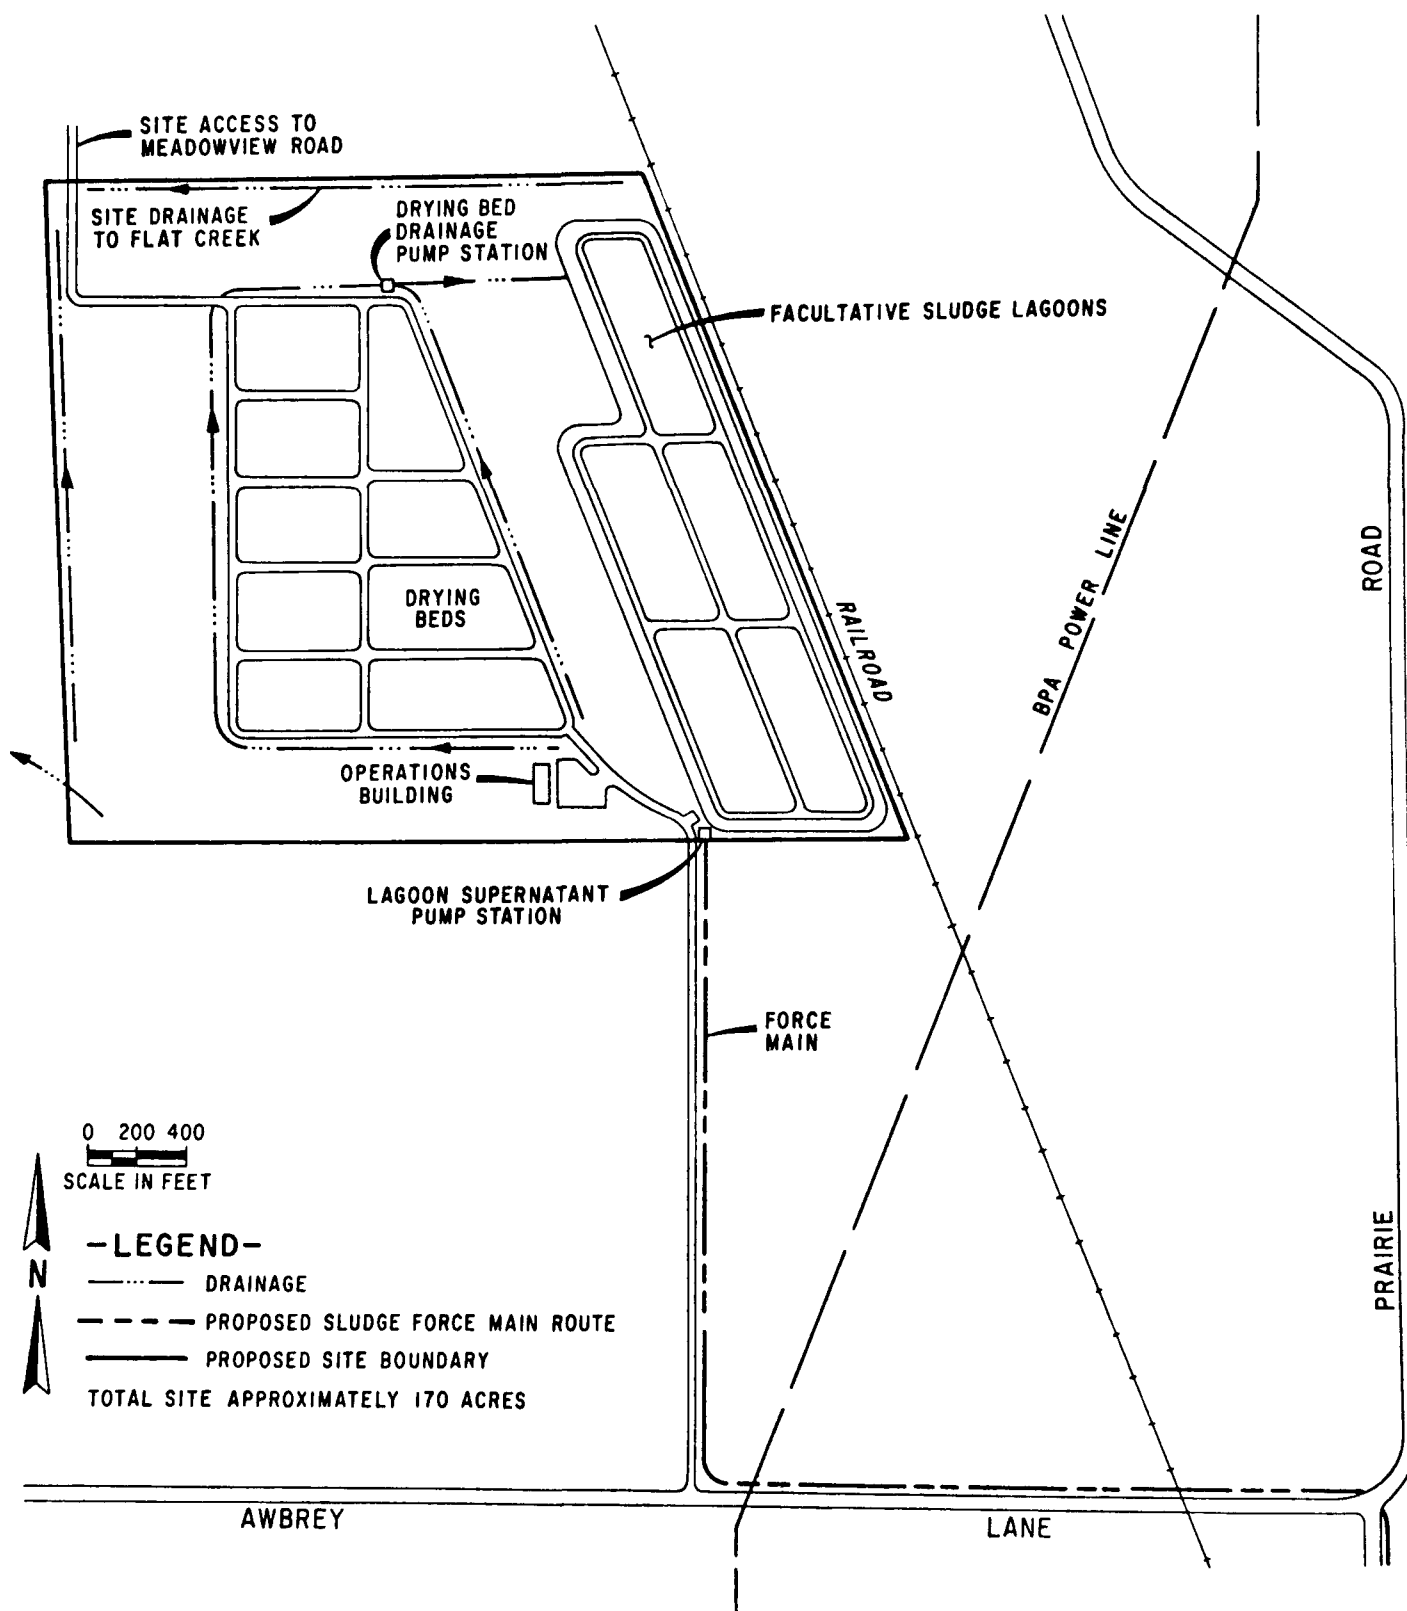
ALTERATIVE 1 FACILITIES LAYOUT AT SITE C
